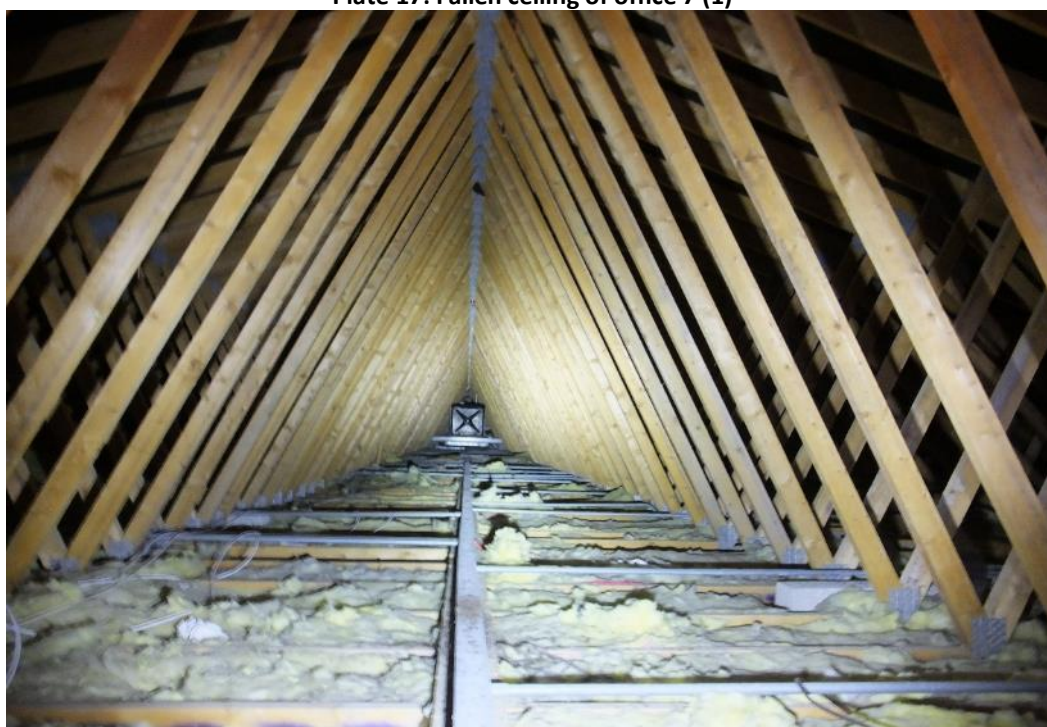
Dark shape in centre of rafters is loose ceiling felt, in which bats had been roosting (1)
